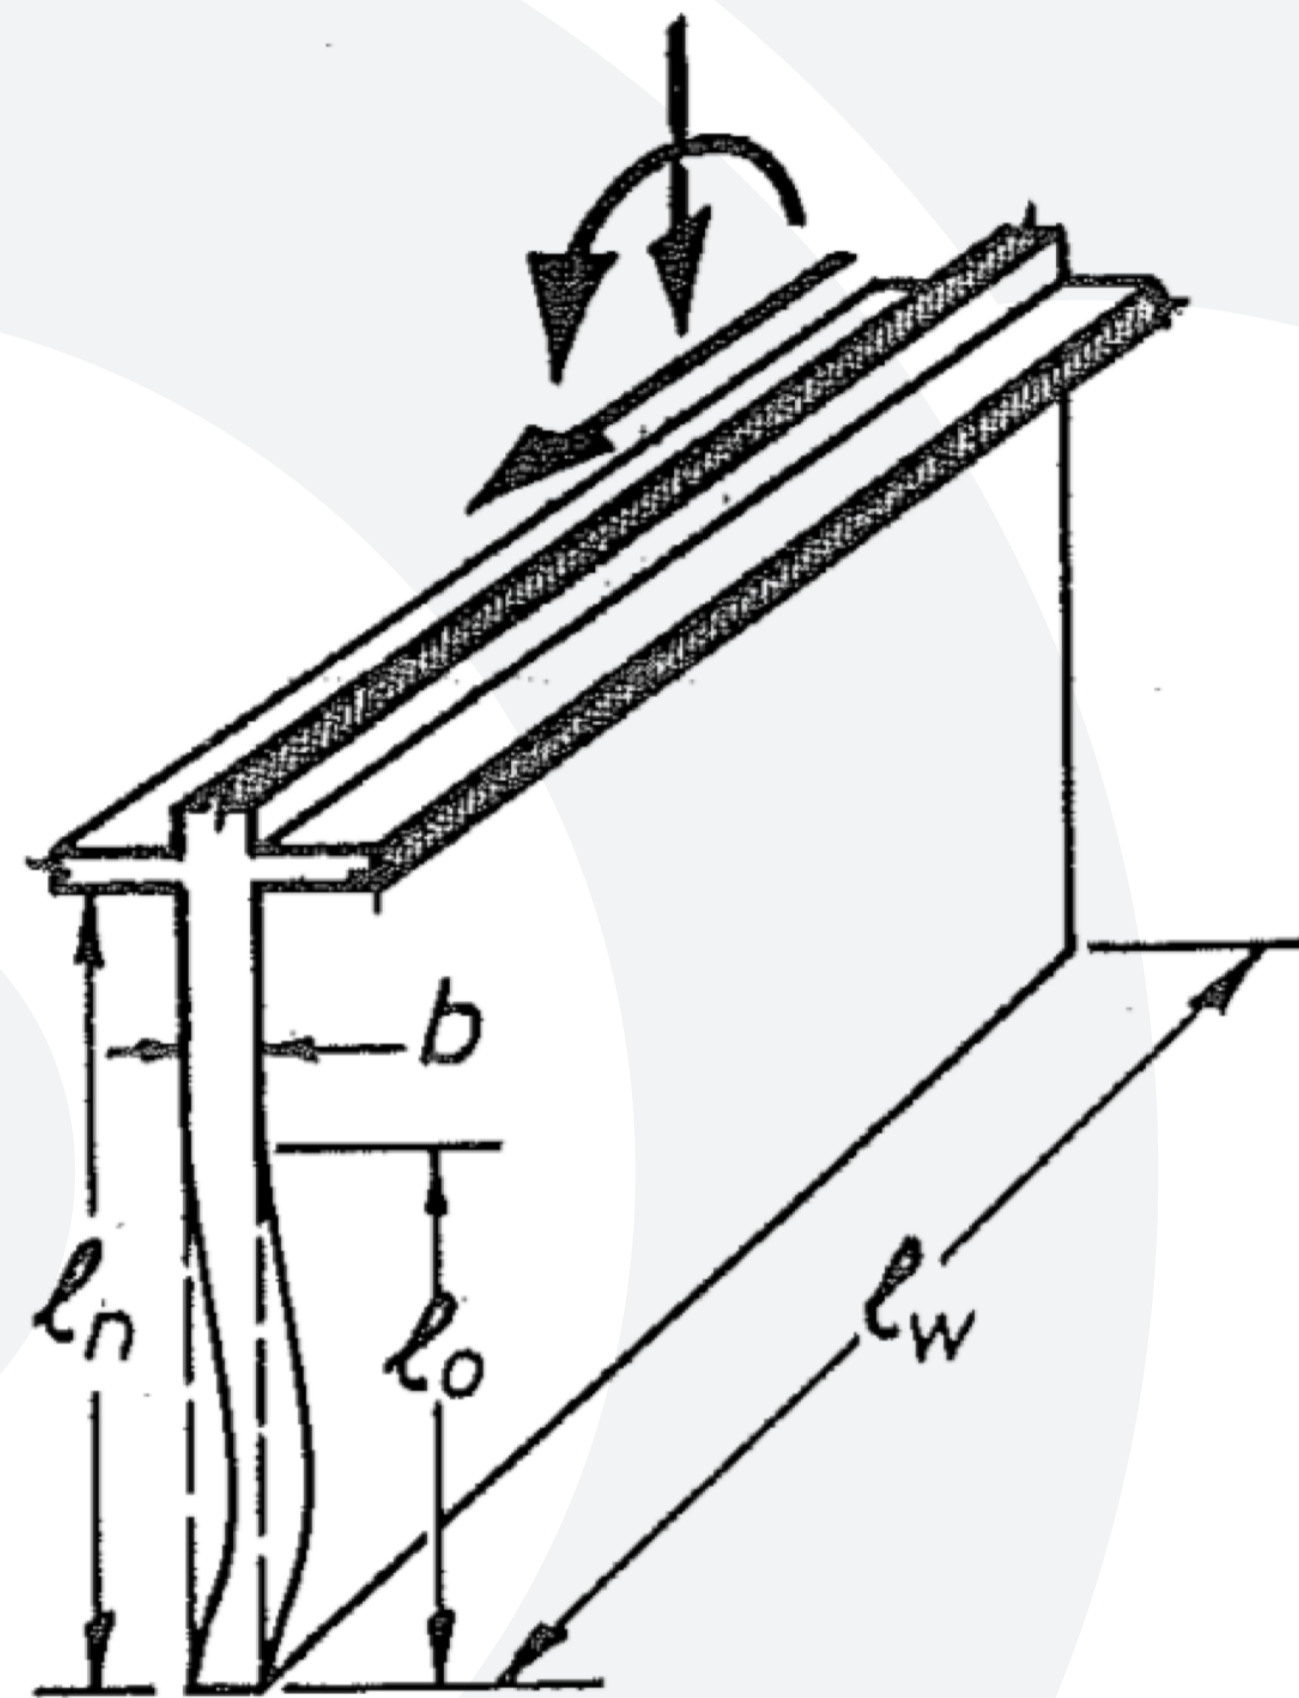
Out-of-plane instability (Paulay and Priestley 1993)
